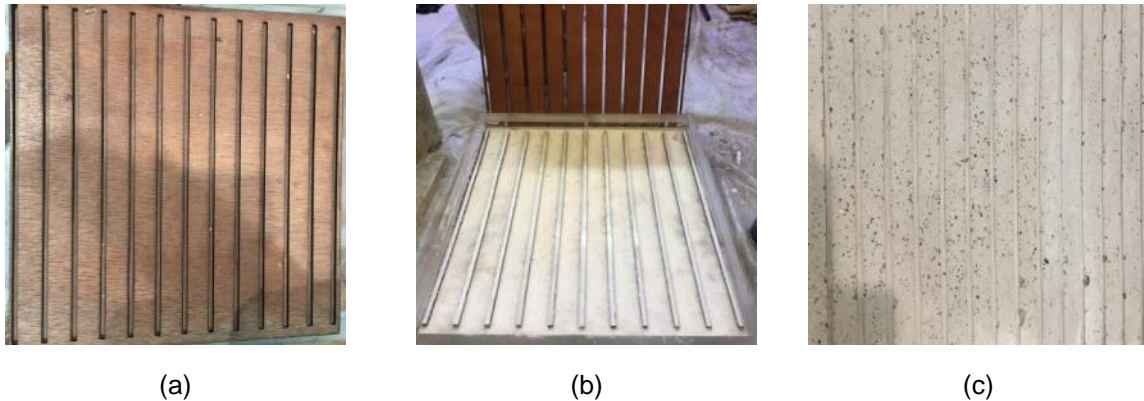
Method 5<sup>th</sup> prefabricated grooves with silicone rubber: (a) negative wooden mold plate grooves with Styrofoam (b) casting silicone rubber for the prefabricated mold (c) results of grooved ECC sample by using mold made of silicone rubber
